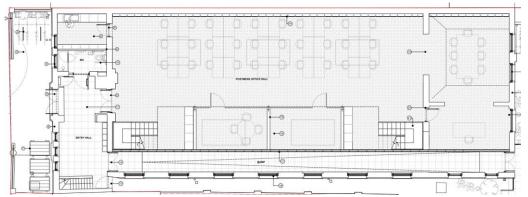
Proposed Post Office Plan (Ground Floor) from permitted scheme 2020/0644/P
